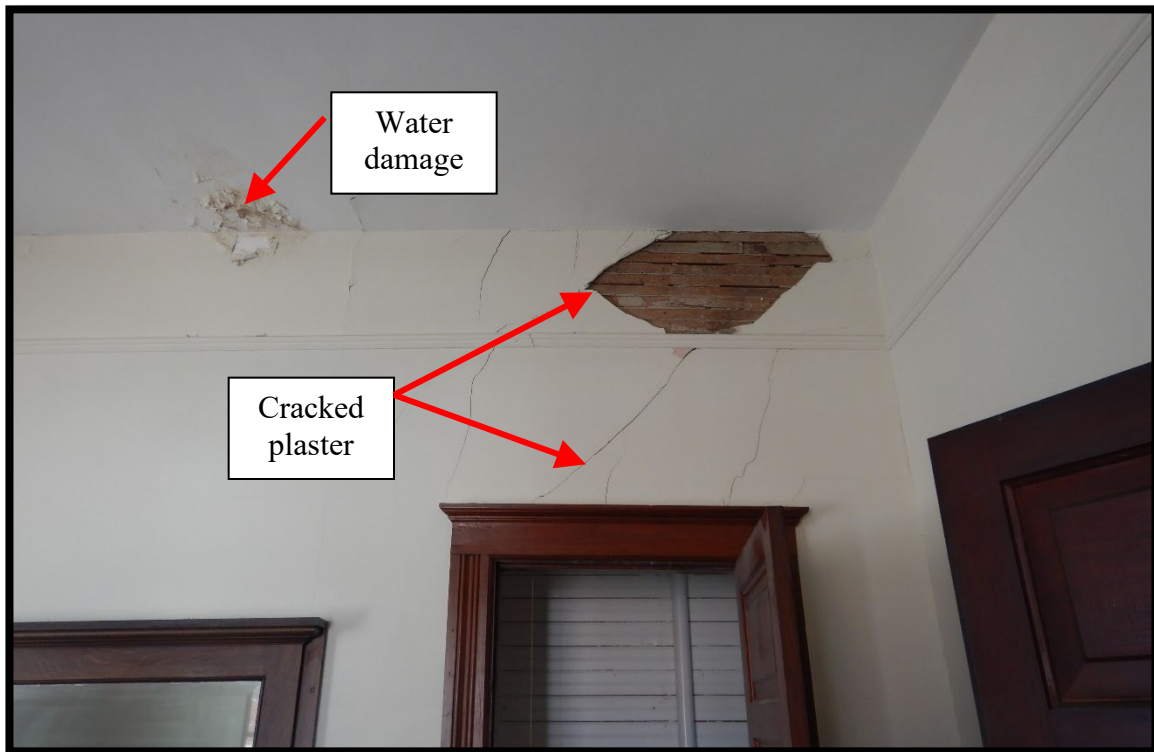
Cracked plaster and water damage upstairs.
